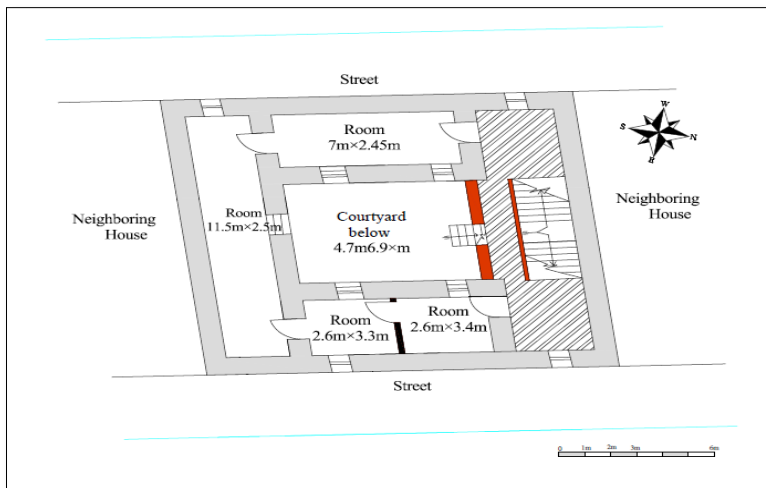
First floor plan of Mahmoud Sola house in Tripoli.
